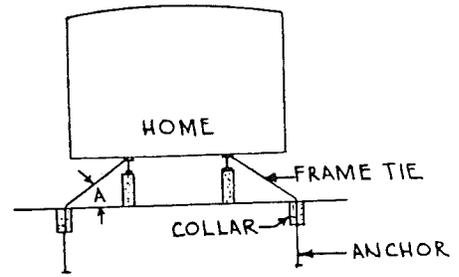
Frame ties extend diagonally downward from I-beams to anchors.
